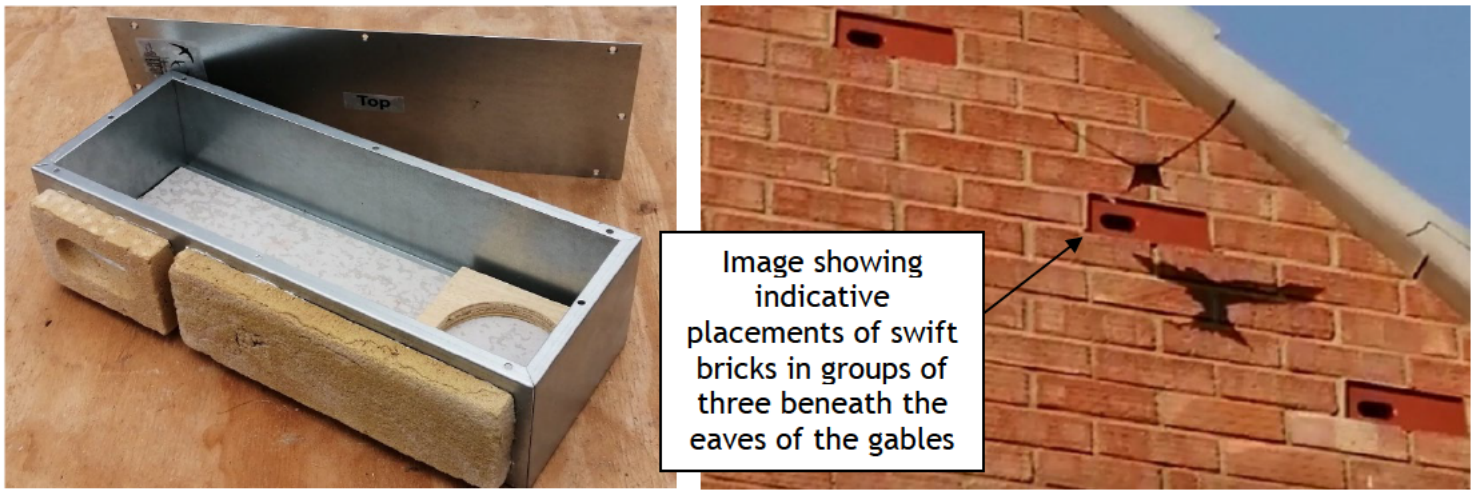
AfS S-bricks to be established to the northern and eastern elevations of Apartments 10-58 and 59-66
